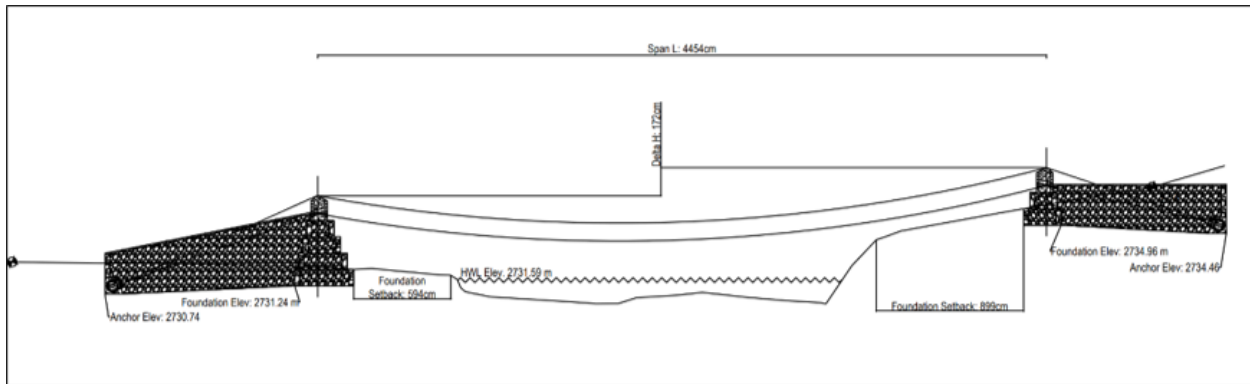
A dimensioned drawing of standard design bridge showing span and abutments
